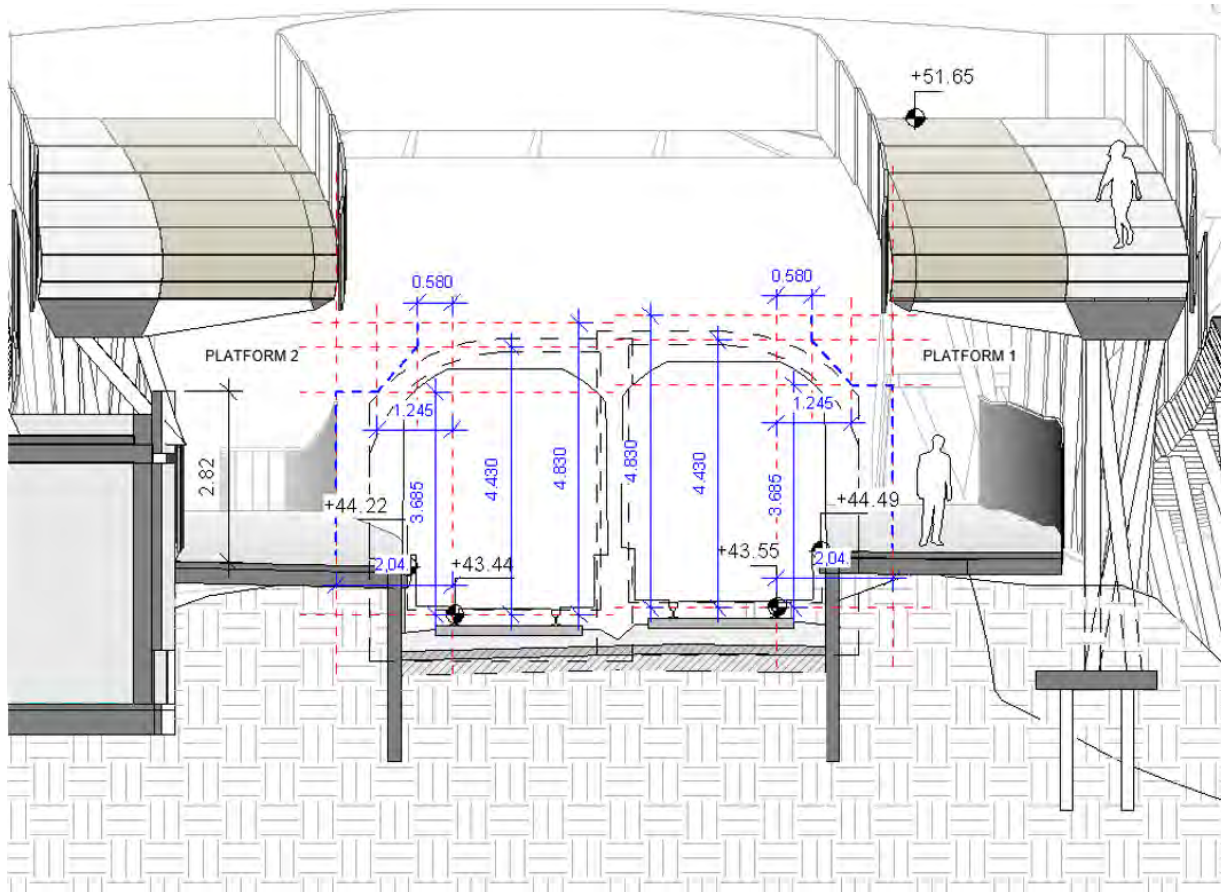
Section of proposed Ashtown bridge showing clearances
